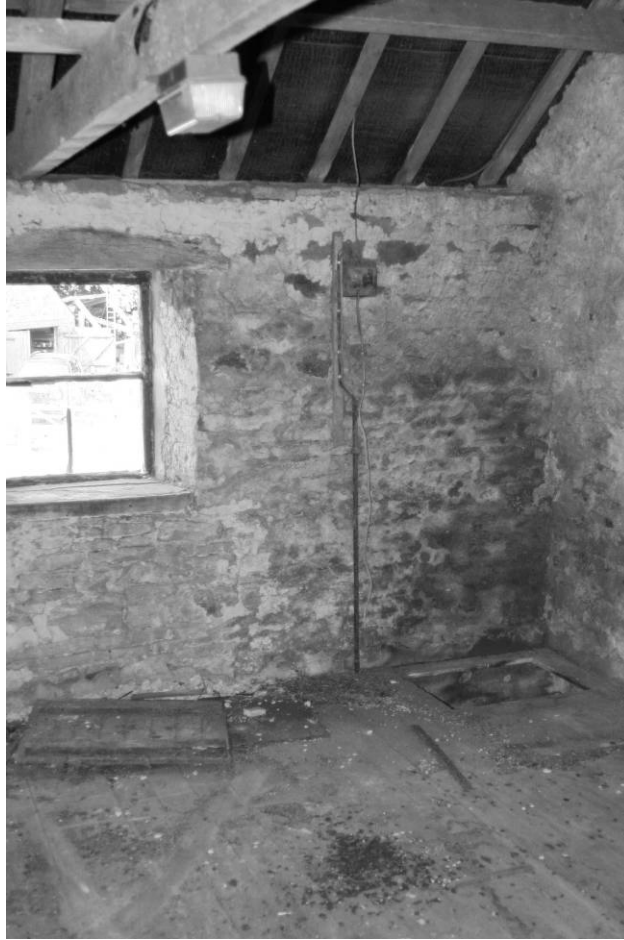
Combination barn, west range, south part, west facing elevation (north part) (scale 1m)
